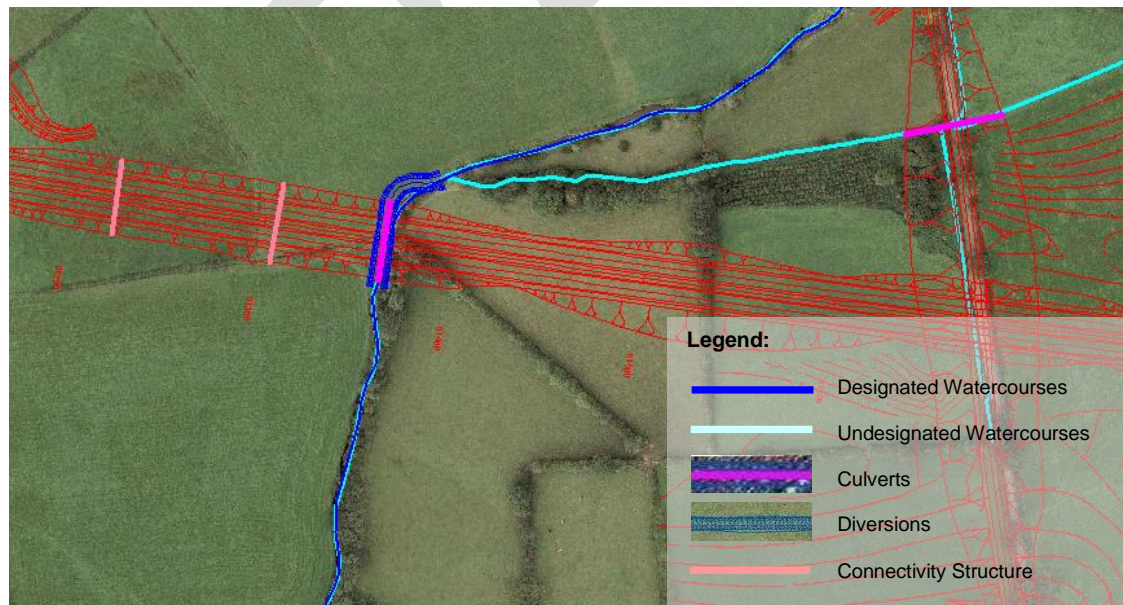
Plan of Roughan River and Undesignated Watercourse Diversion (S3-WD-90), Culvert Arrangement (S3-PC-34 and S3-PC-68) and Connectivity Culvert Arrangement (S3-CC-01 and S3-CC-02)
